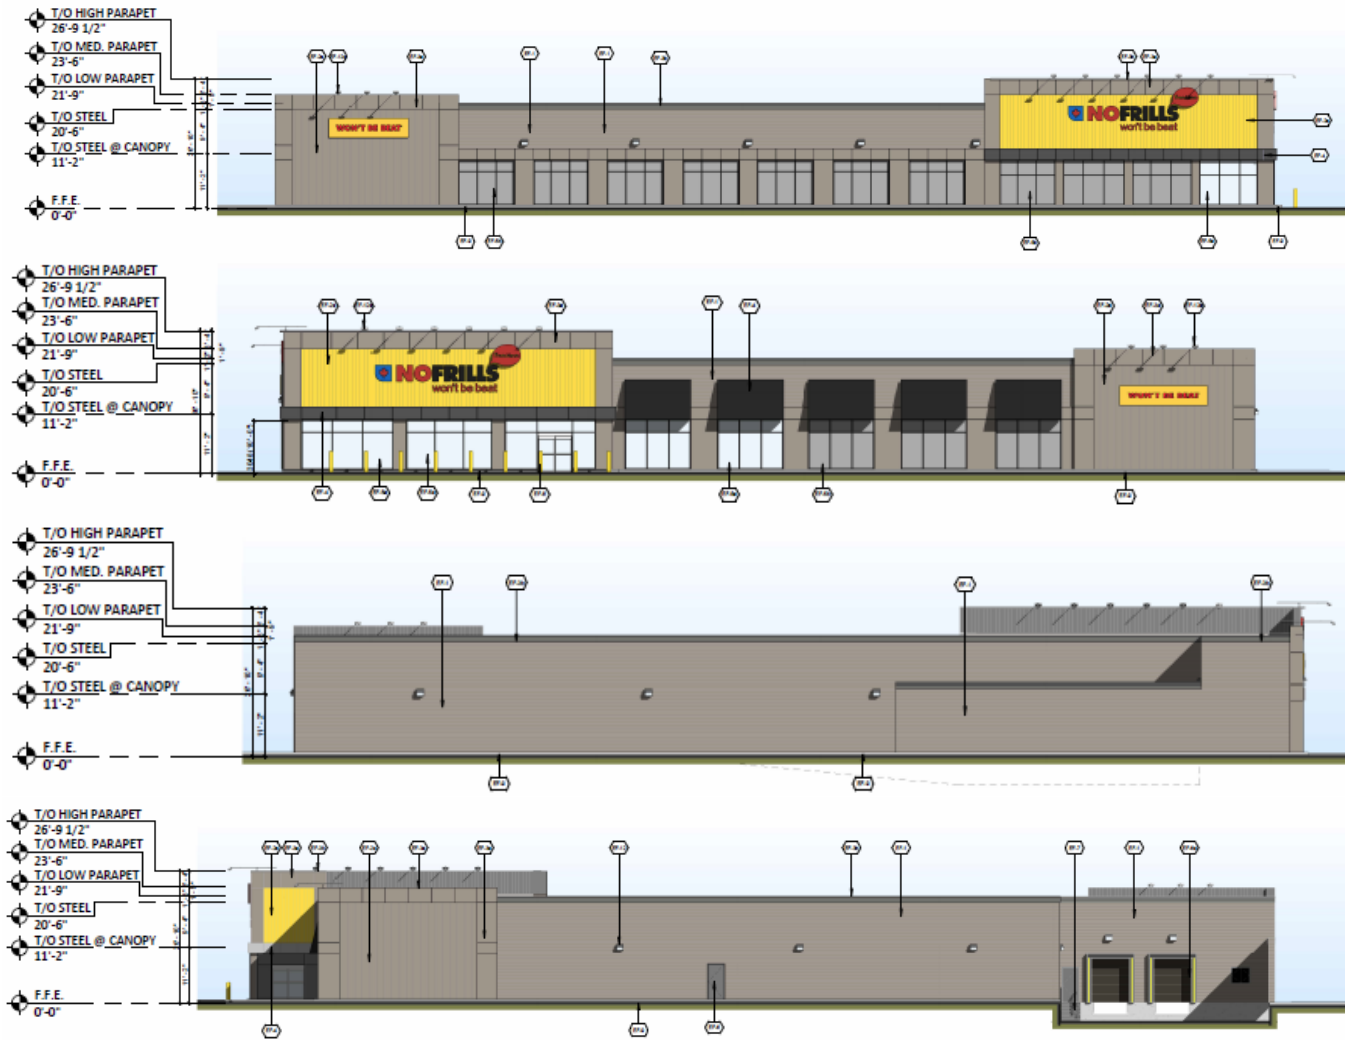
Elevations of the primary grocery store building (From top: East, North, South, and West)
